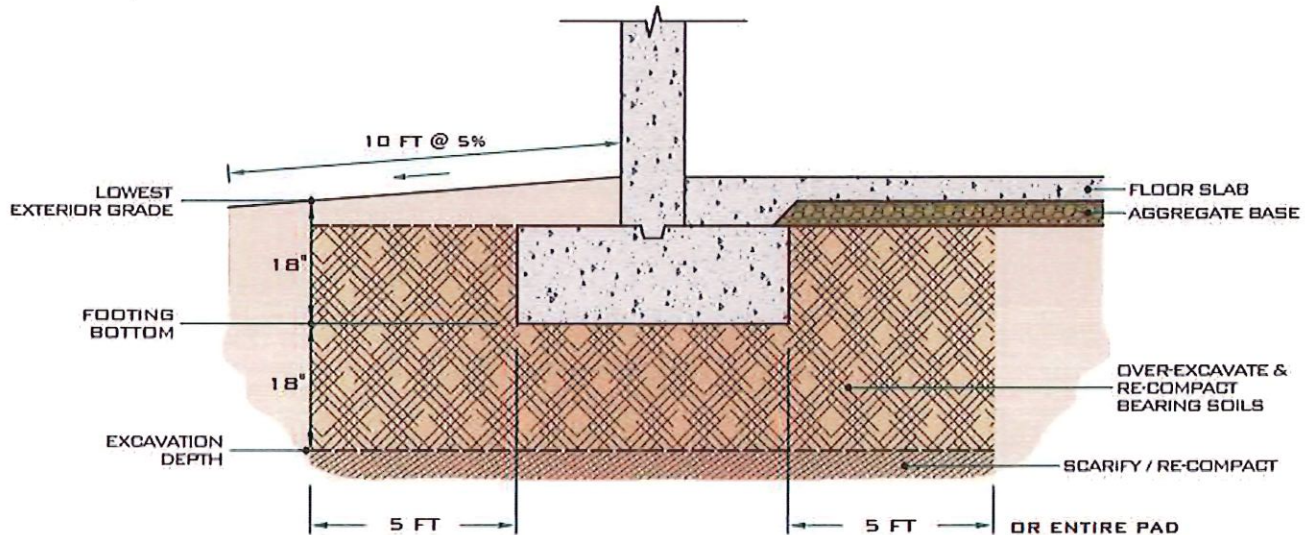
Foundation Detail – Bearing on Engineered Fill
